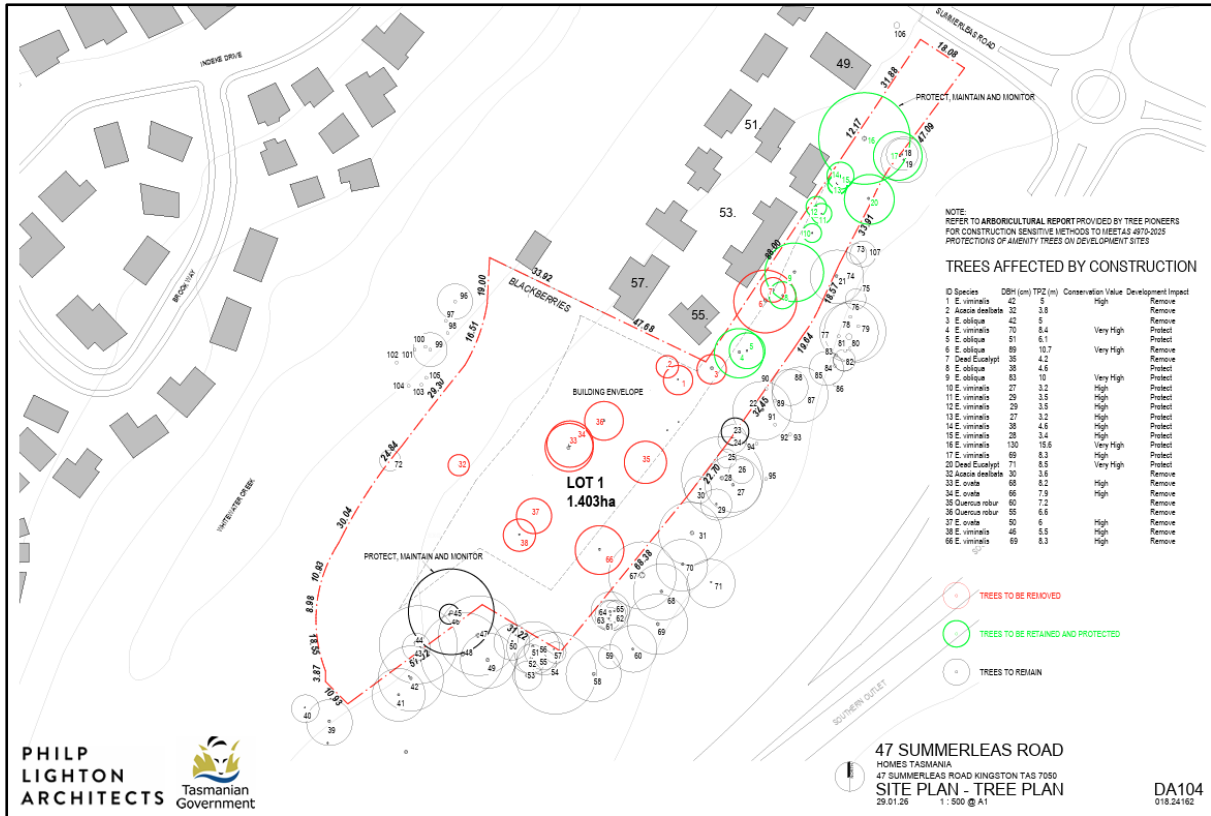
Plan of site with tree numbers and TPZ. Plans provided by Philp Lighton Architects.
